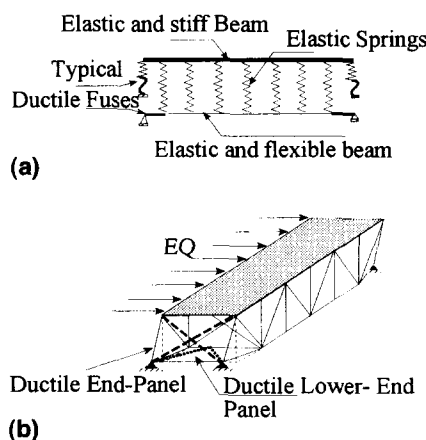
Ductile Retrofit Concept: (a) in 2D Model; (b) Implementation in Actual Deck-Truss Bridge
